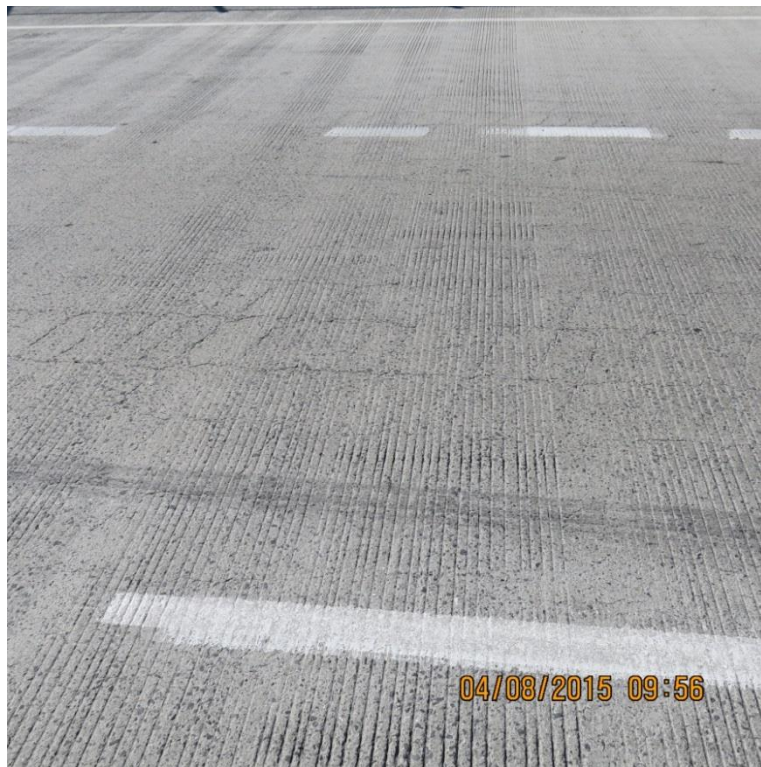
Bridge H-2288 bridge deck with readily visible cracking throughout.
